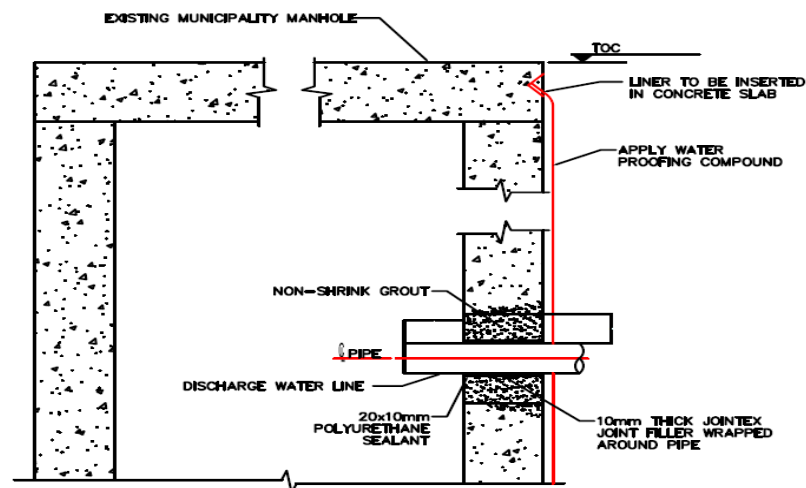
Discharge pipe underground connection to main municipal sewer manhole
